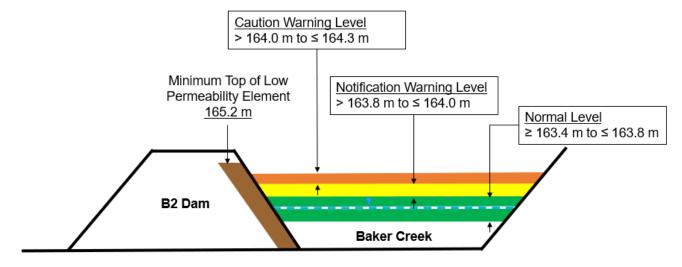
Water and Infrastructure Elevations for Baker Creek (not to scale)
